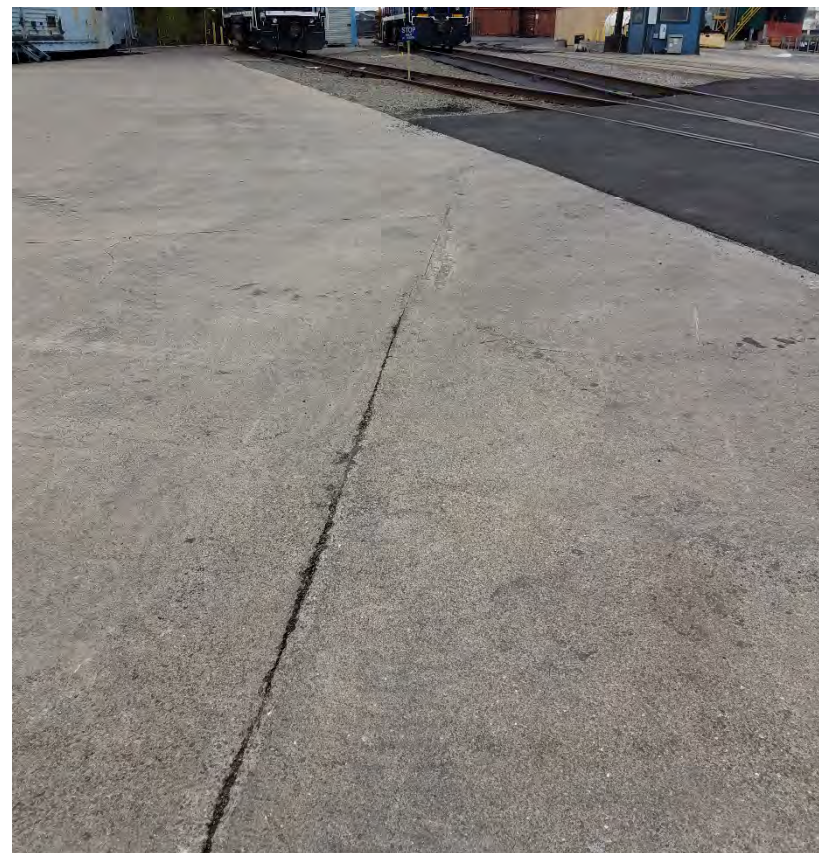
Looking southeast: concrete seams with new asphalt in background.
